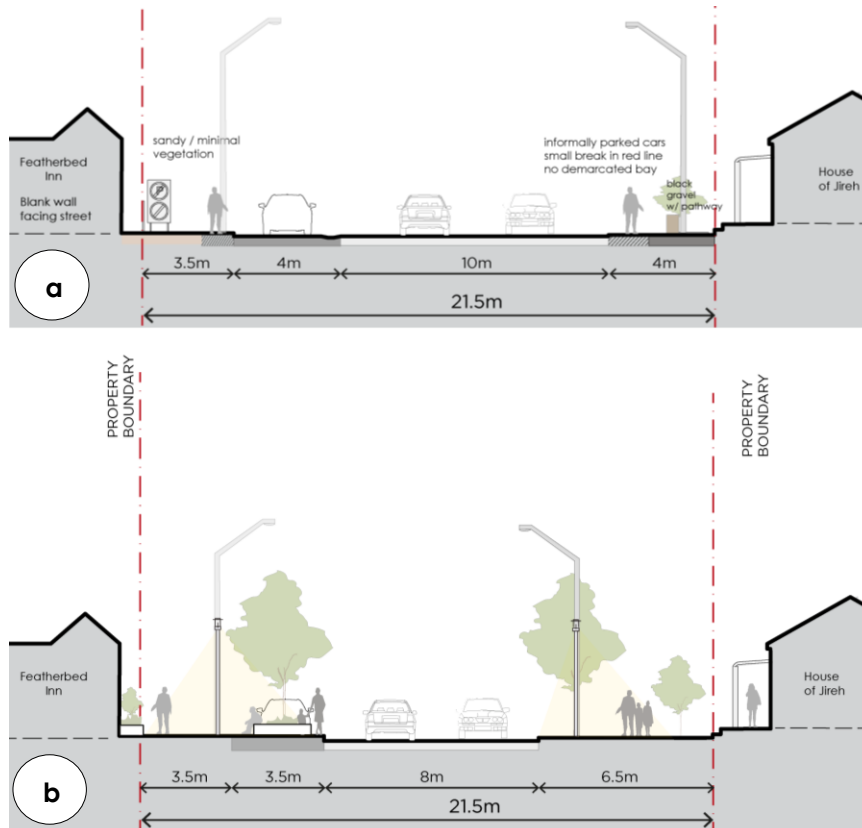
Existing Hoof Straat section (a); proposed Hoof Straat section, with widened sidewalks (b)
